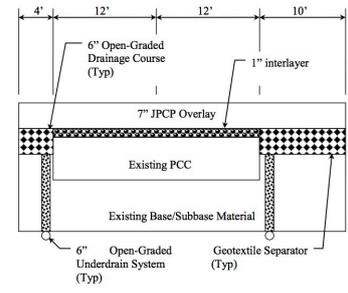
New Overlay Drainage System: OGDC Shoulder Design
